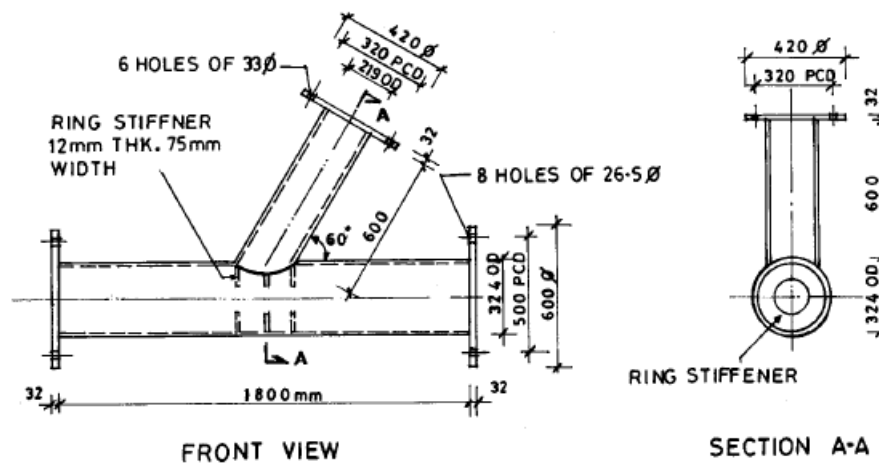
Typical undamaged stiffened Y-joint (T. S. Thandavamoorthy, 2000)
